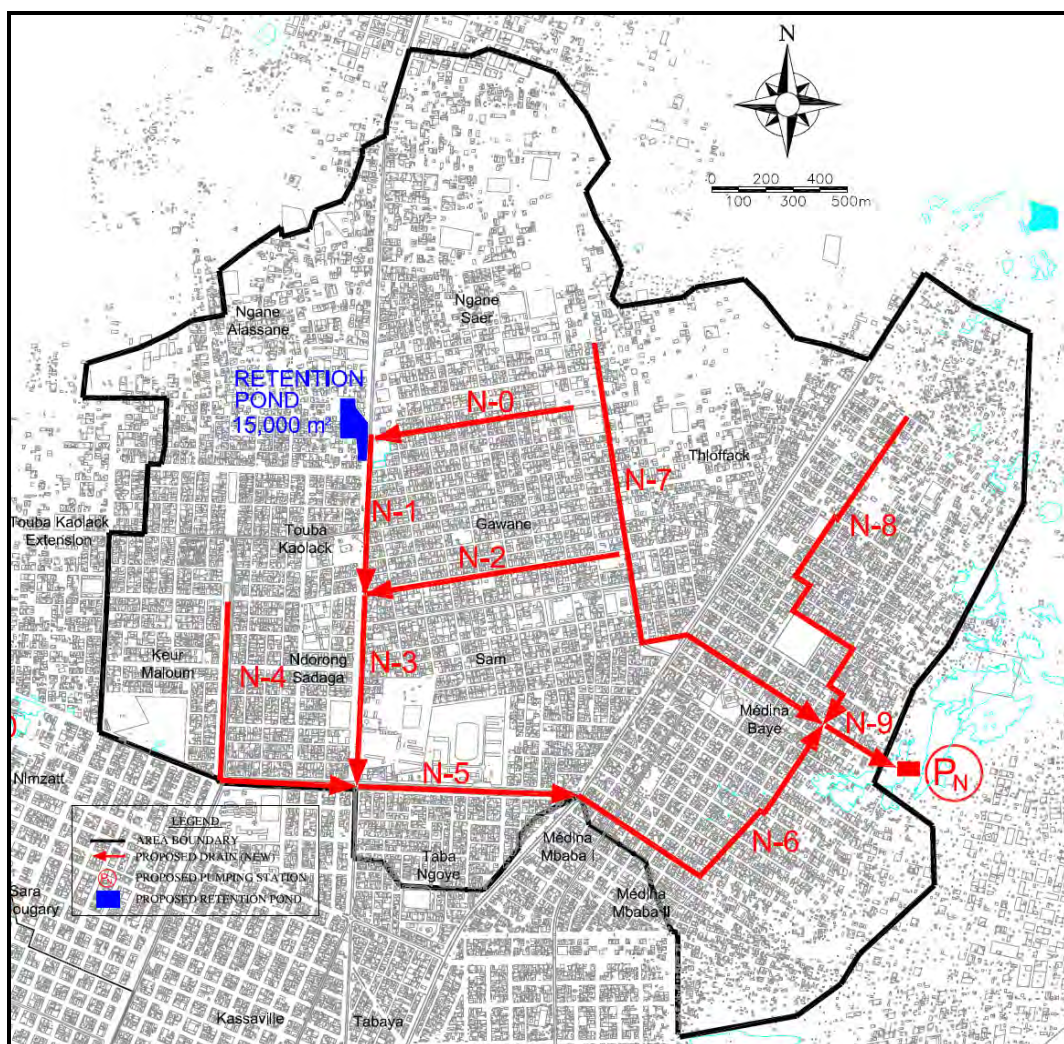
Location of Proposed Drainage Facilities for North Area
